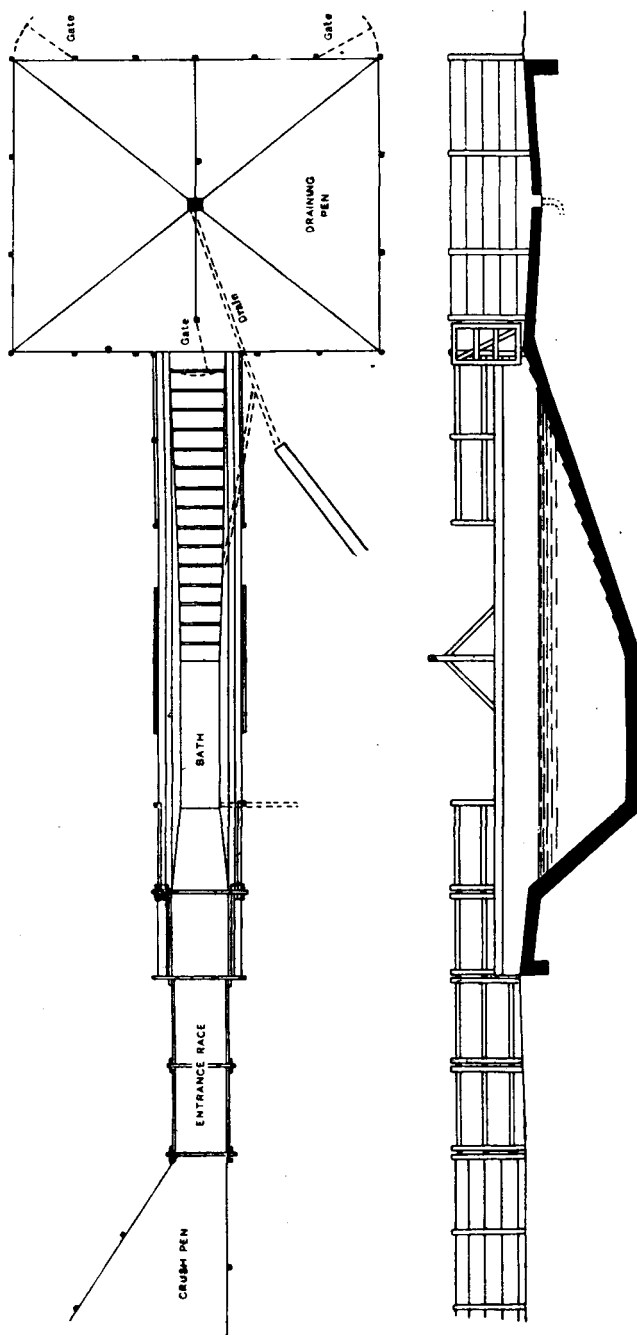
Plan and elevation of Cattle Dipping Bath.
